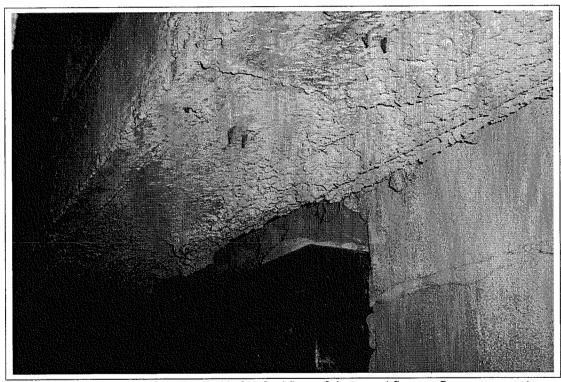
20th floor, NE Fresh Air Shaft - View of damaged fireproofing on concrete structure (above dust sample location #1)
